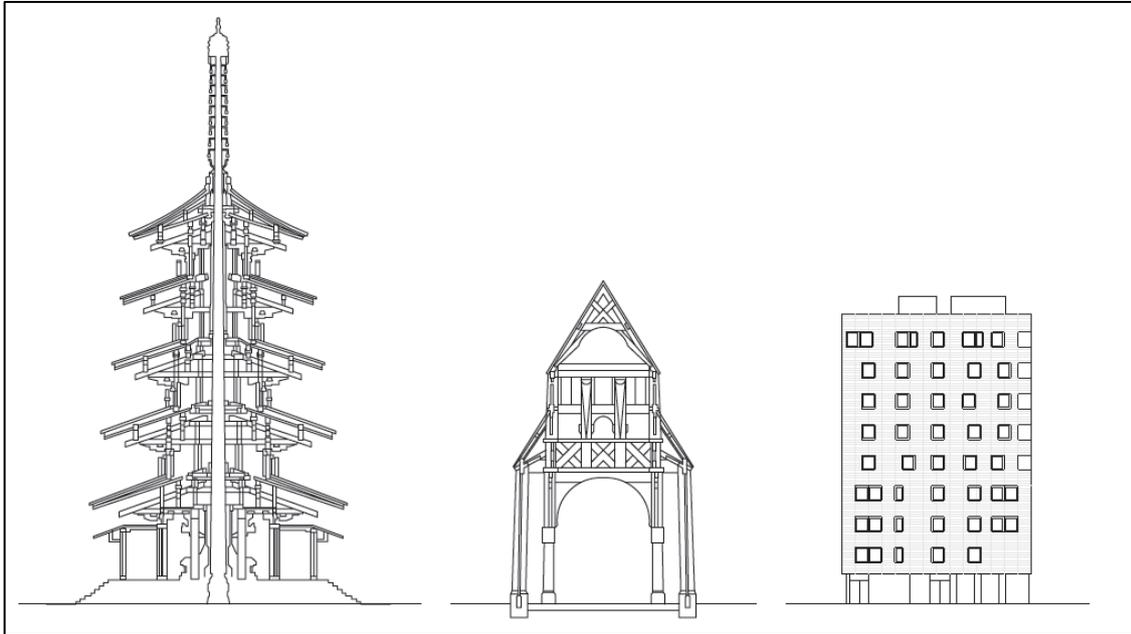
From left to right, Horyu-ji Temple Pagoda, Urnes Stave Church, Stadthaus
